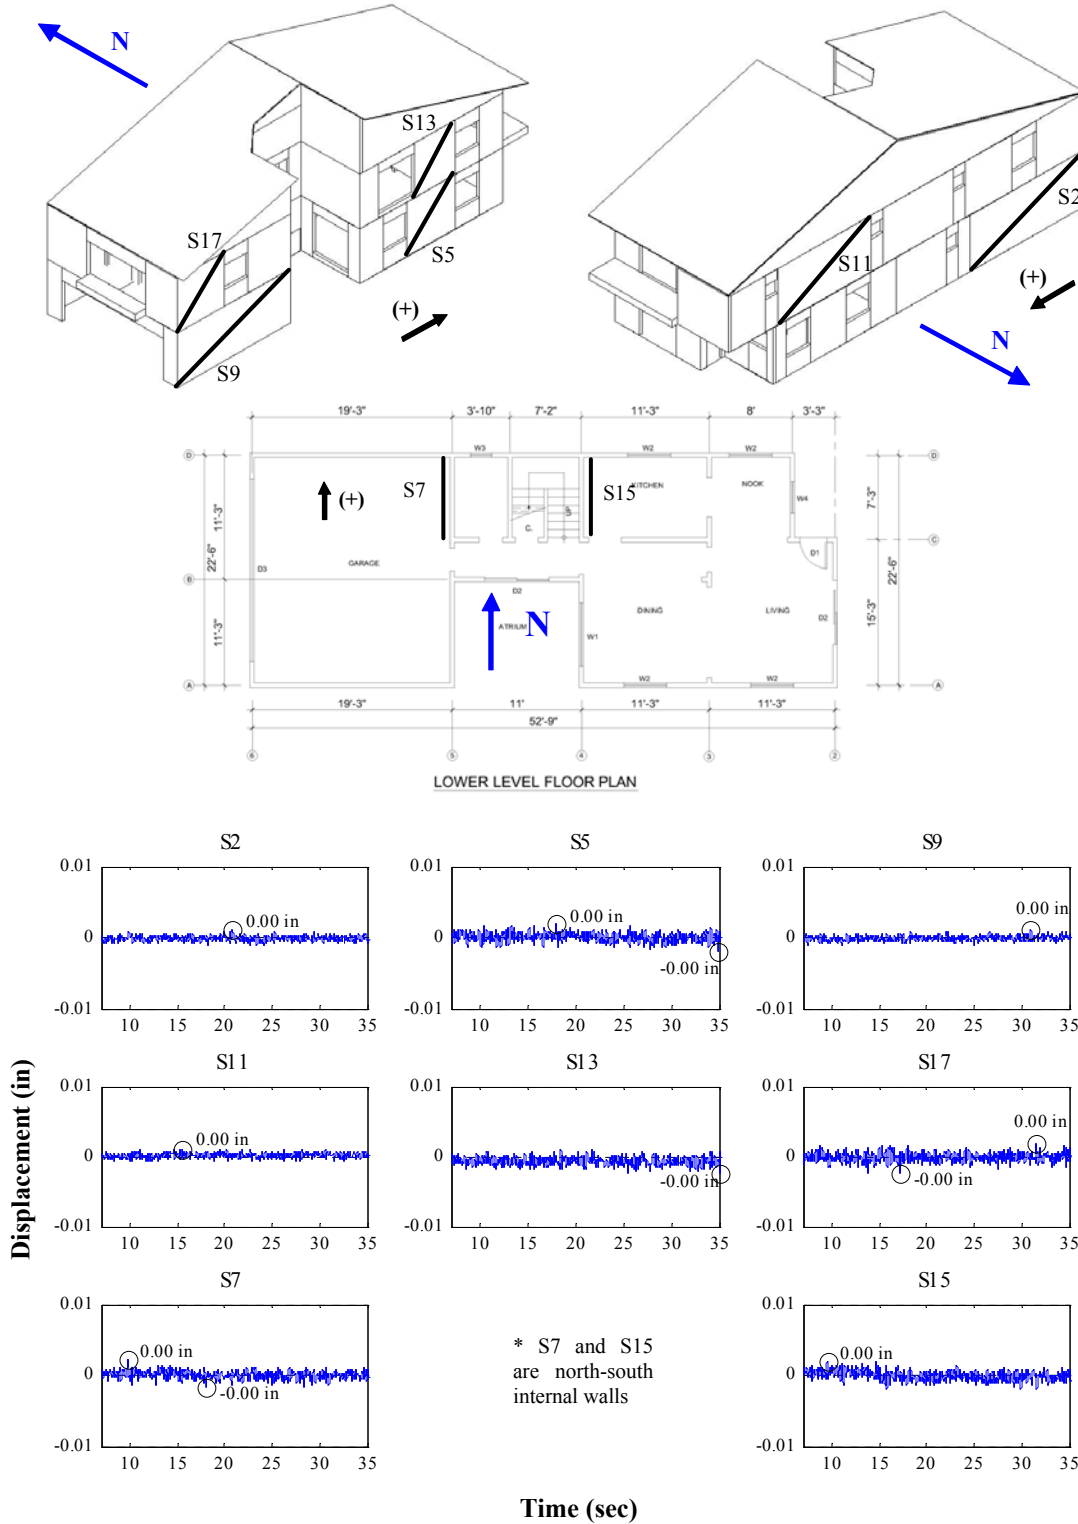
Wall deformations of east-west internal walls for Test NWP2S01
